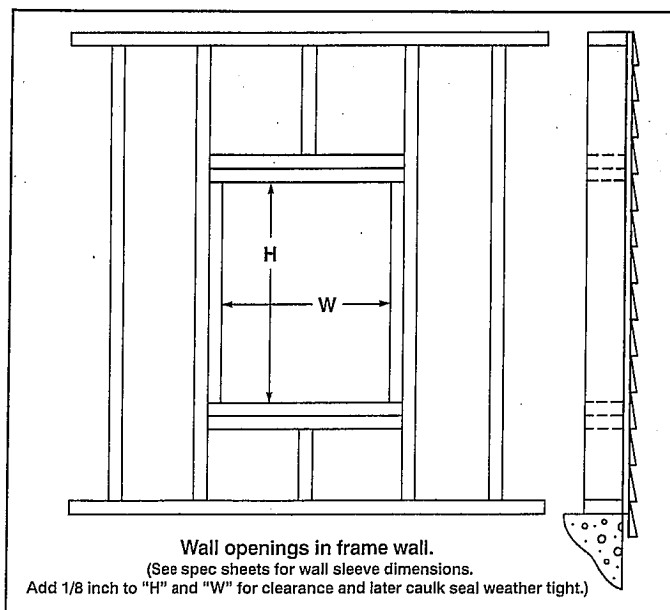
Line drawing of frame wall with opening braced for wall sleeve attachment.
